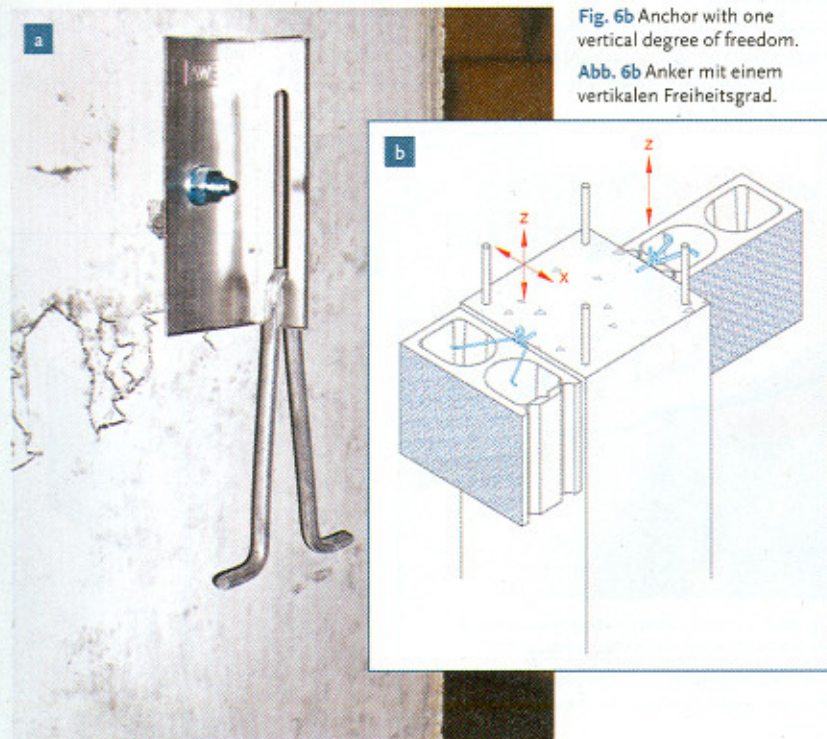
AllWall anchors with 1 and 2 freedoms of movement, for outer facing walls and enclosed walls respectively.
